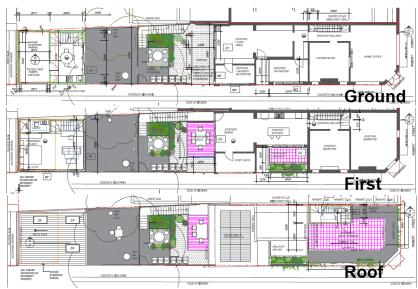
Amended DA floor plans, ALINEA DZINE Pty Ltd dated 24/10/2024.
